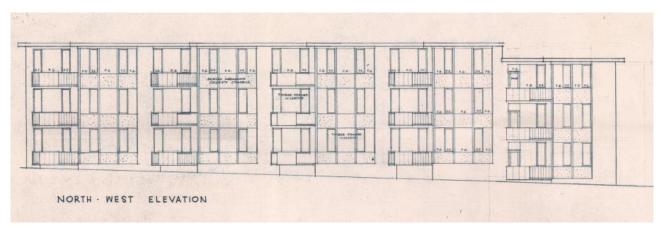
1968 drawing showing the north-west or garden side elevation (Source: BP)
